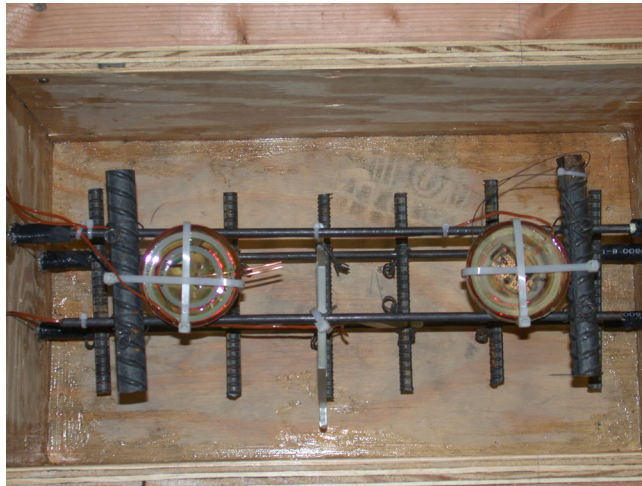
Conductivity (left) and corrosion sensor (right) in place in test slab before casting concrete.
